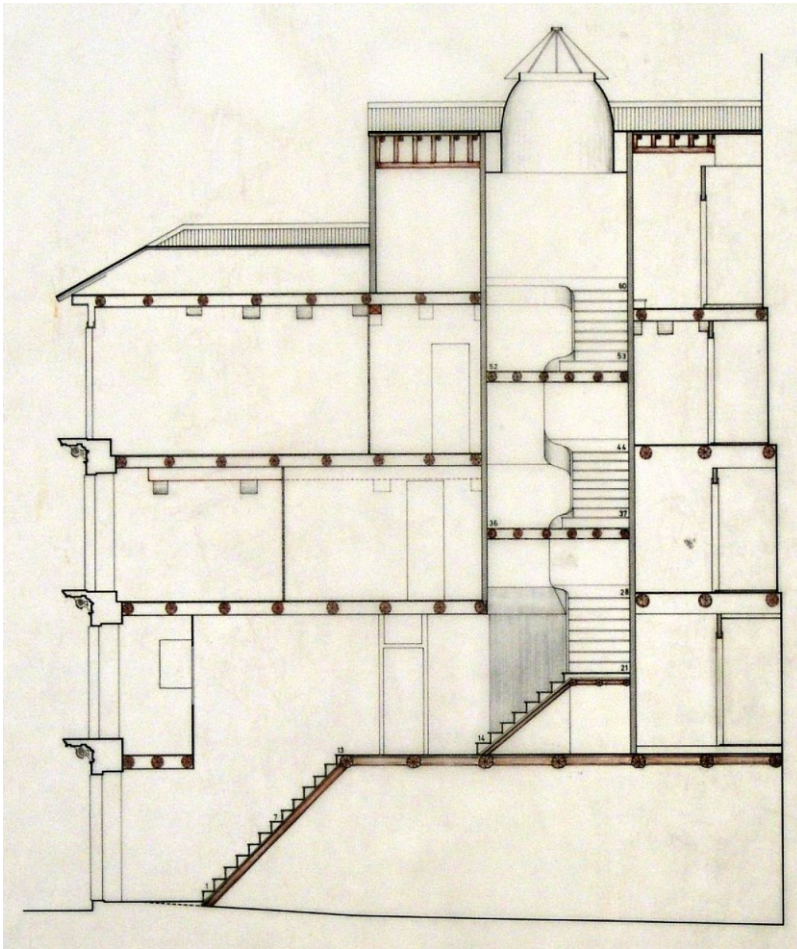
CRUARB archive – Parcel 159 section.⁵¹
